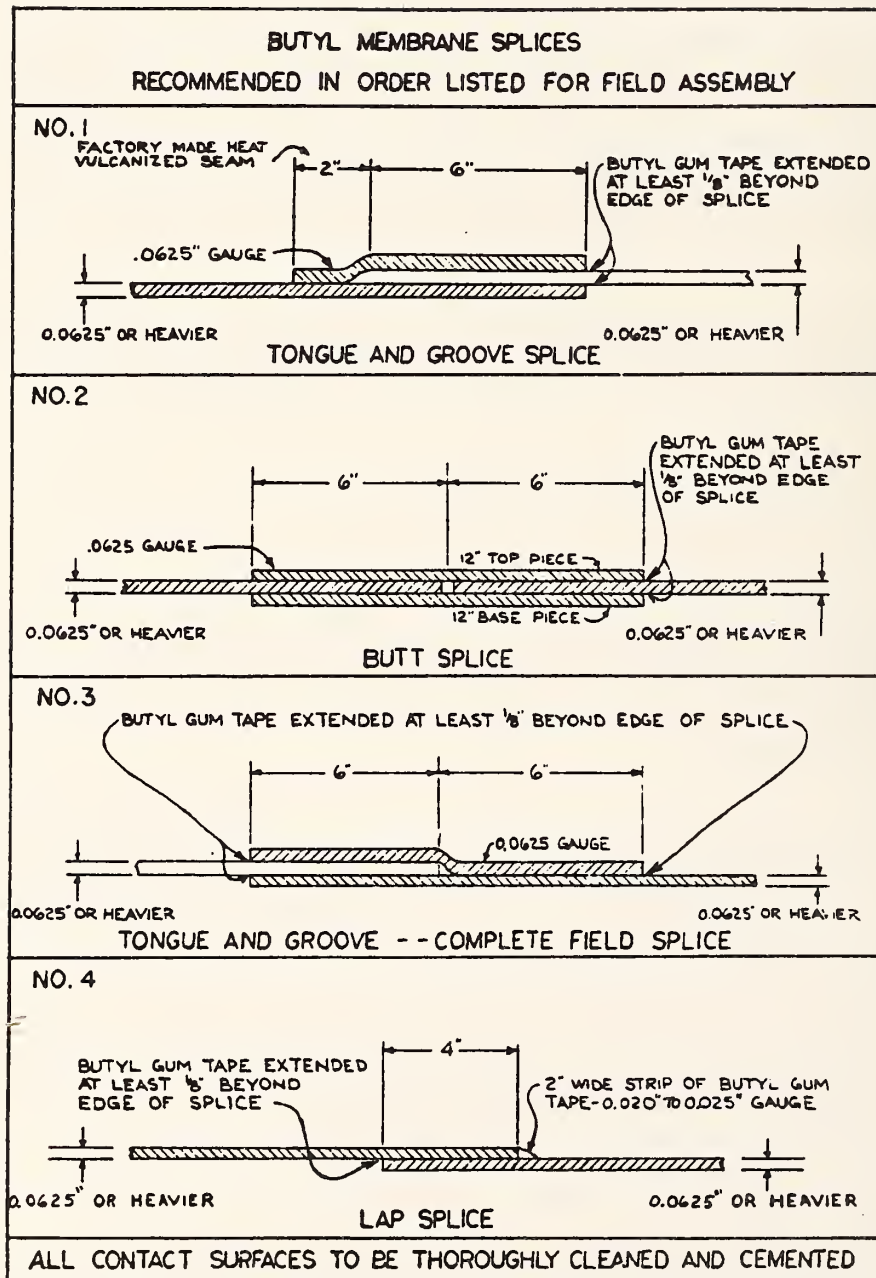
TYPICAL MEMBRANE SPLICING DETAILS
